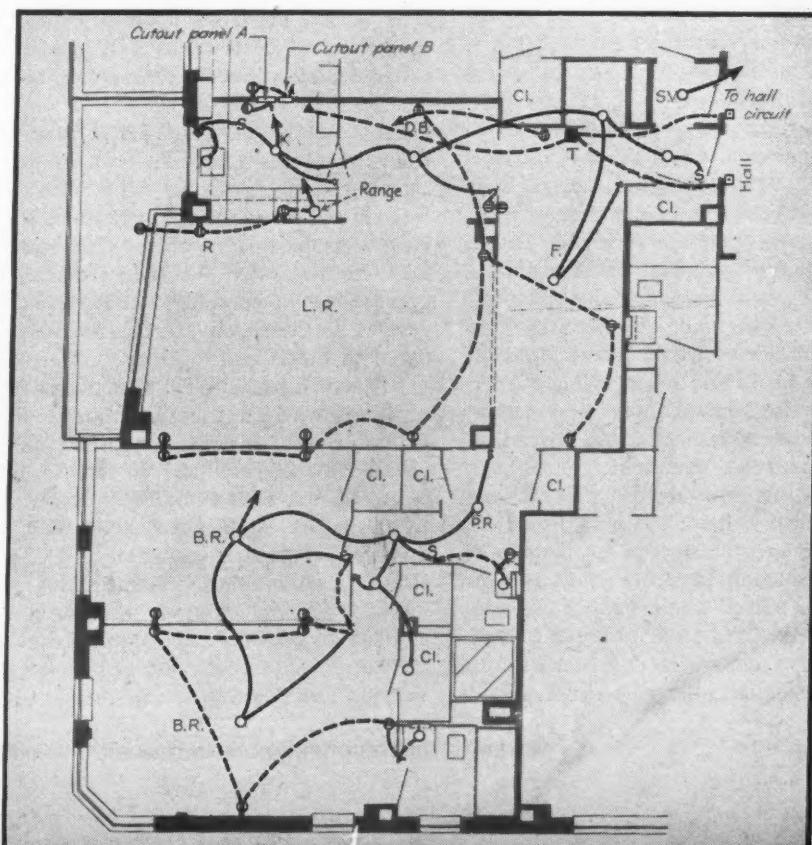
Individual apartment panels are located in kitchen wall dividing two apartments. Feeders for upper apartments are also shown.
